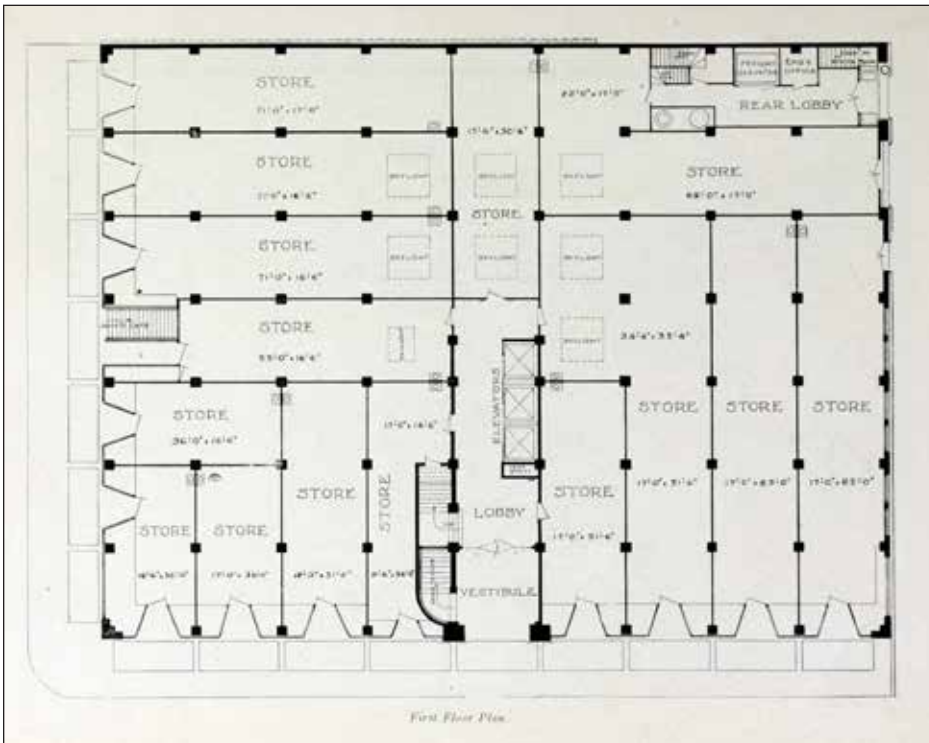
Plan of the Higgins Building's ground floor. Here, eight small squares indicate the skylights that bring in light and air from the light court above into shops in the center of the building. Haley, "A Ten Story Monolithic Reinforced Concrete Building," 43.
